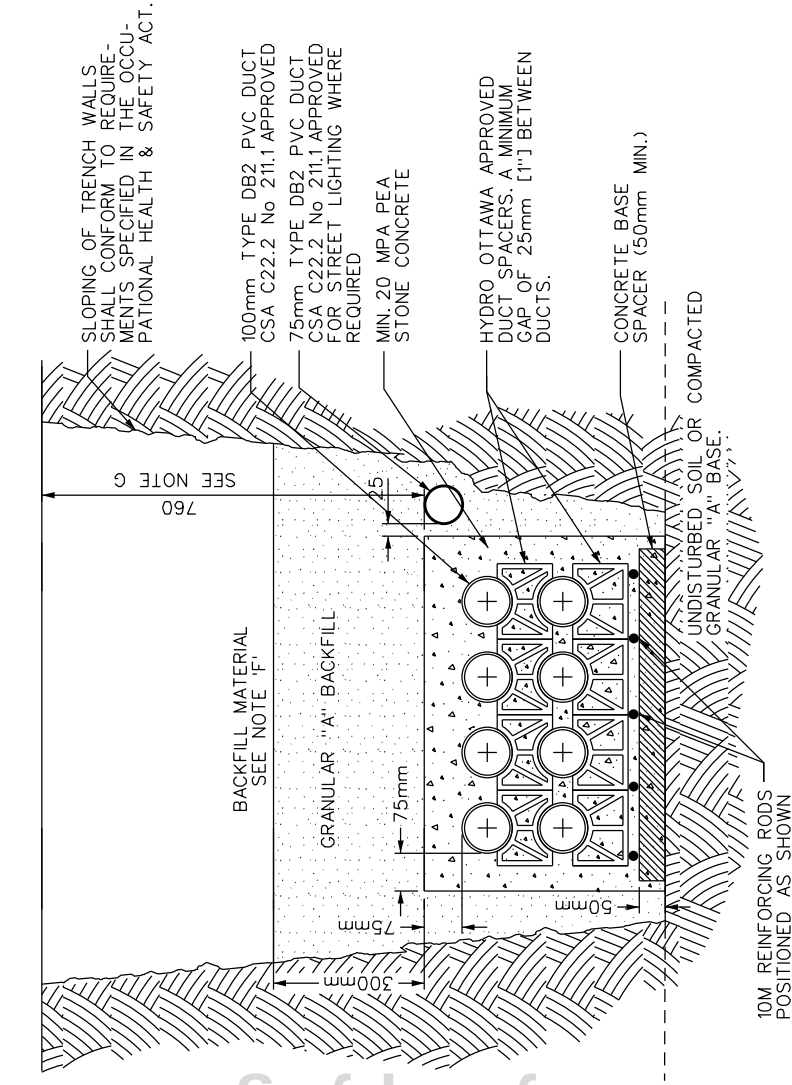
TYPICAL CONCRETE DUCT BANK SECTION VIEW
